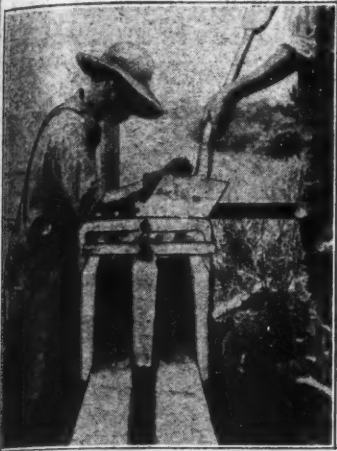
Special forms employed in constructing a double concrete wall for a storage cellar
